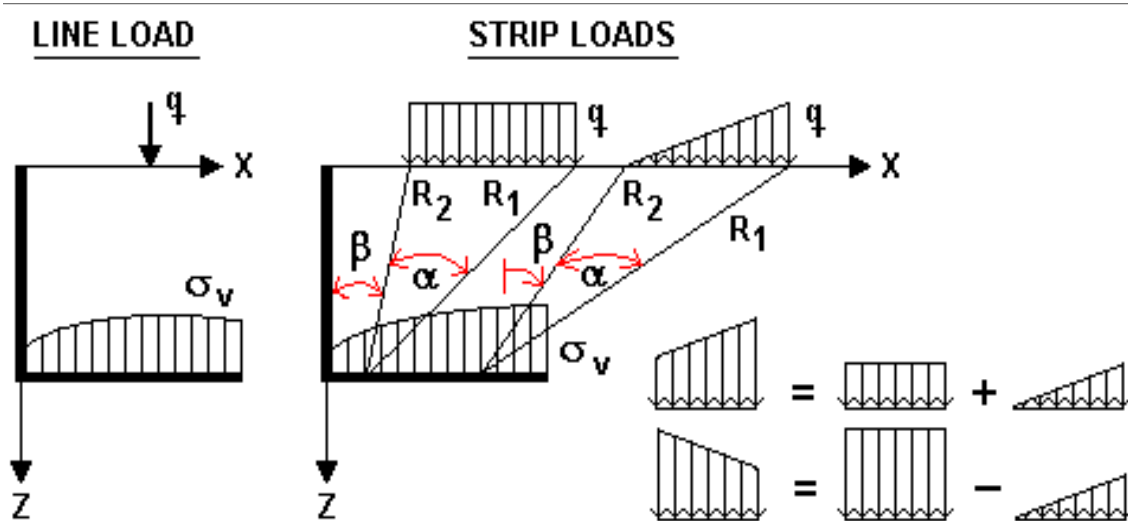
Vertical earth stress on the base of a cantilever wall from line and strip loads on the ground surface as determined by Boussinesq distribution
